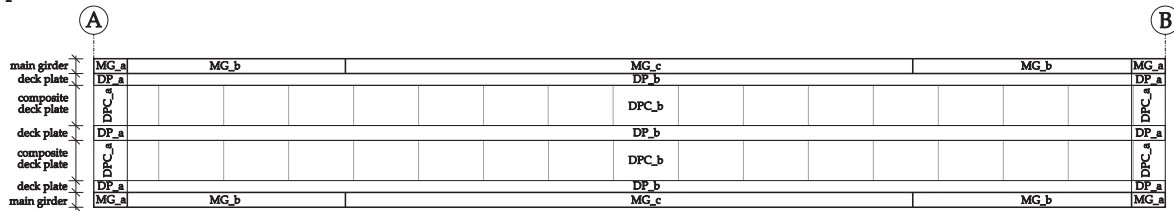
Arch bridge — overview of cross section position and their notation
